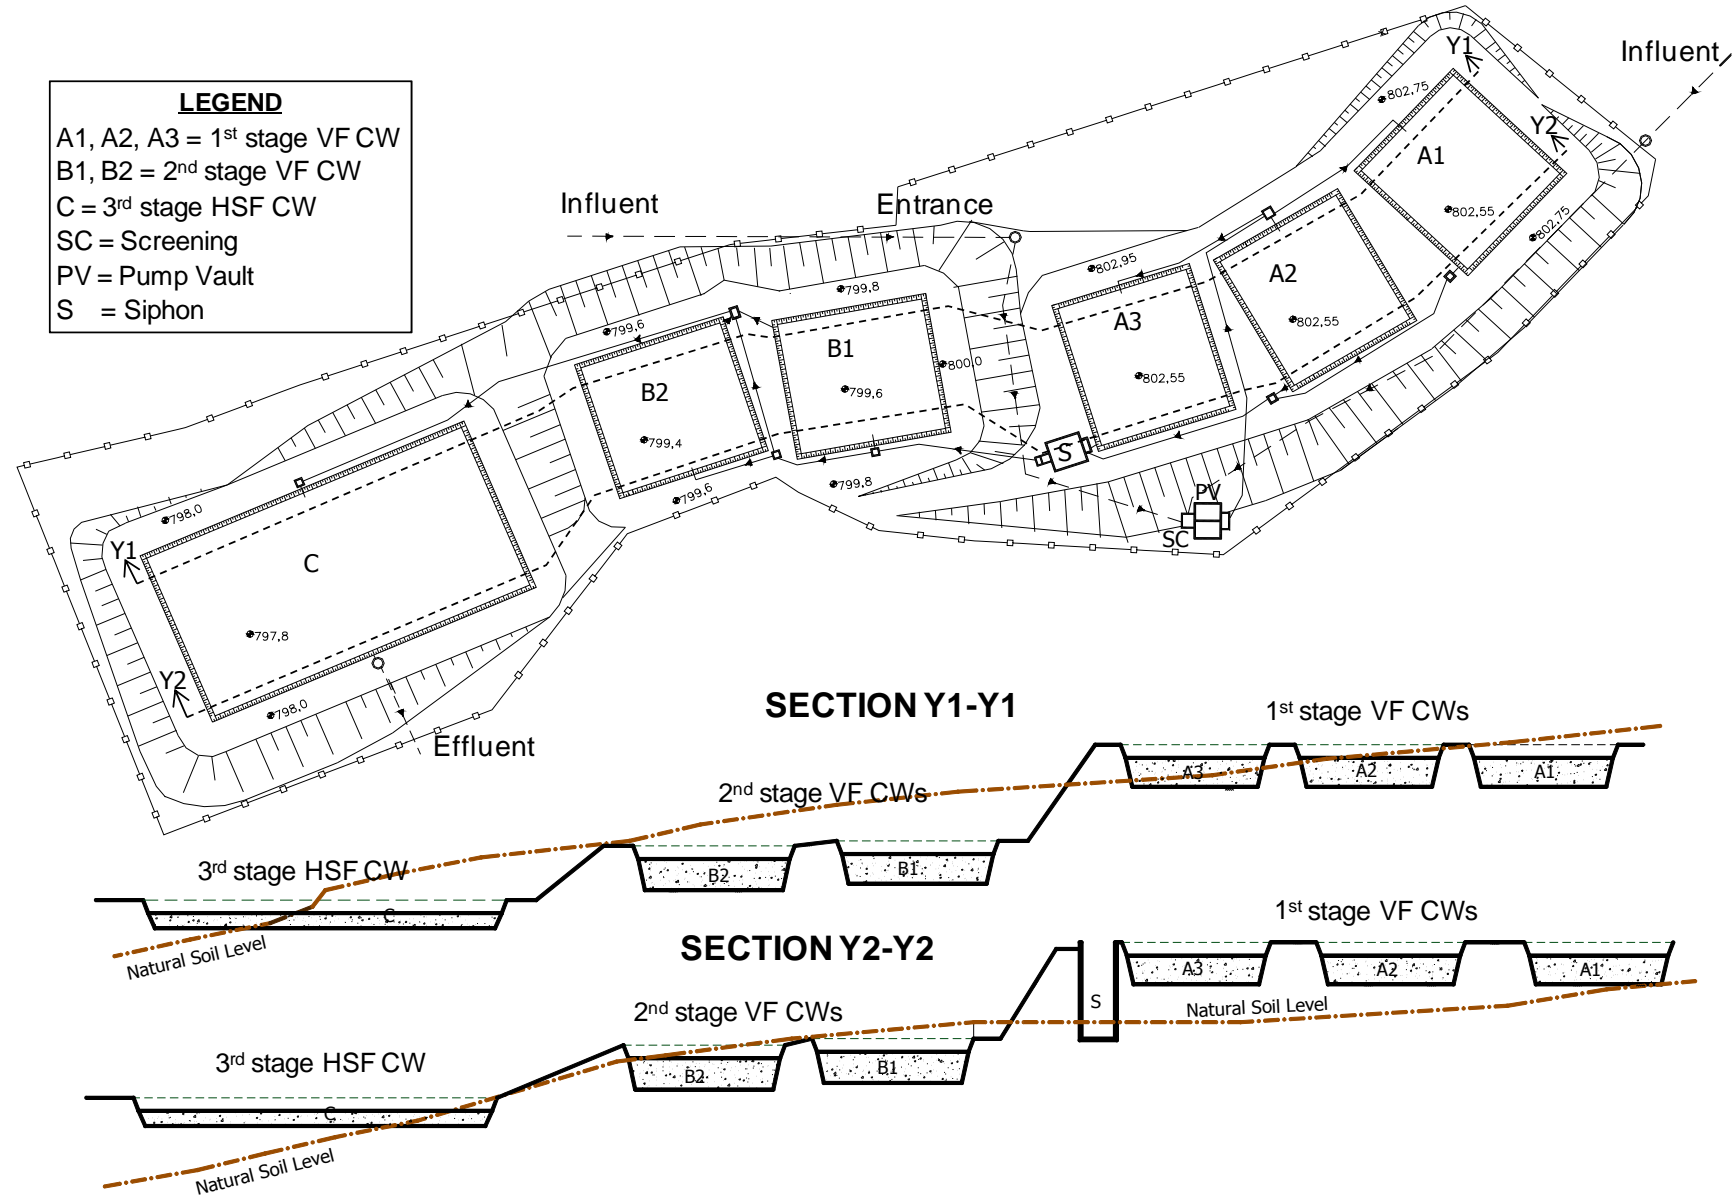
Facility plan view and sections Y1-Y1 and Y2-Y2 of Korestia facility.
